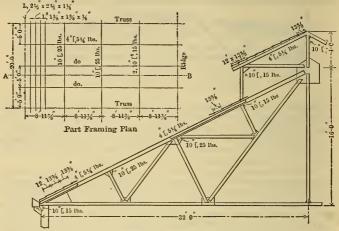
SECTION OF TRUSSED ROOF SPAN.
